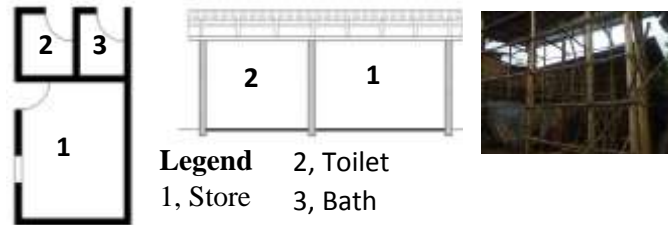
Ato Tariku's store and bath room plan, section and pic
